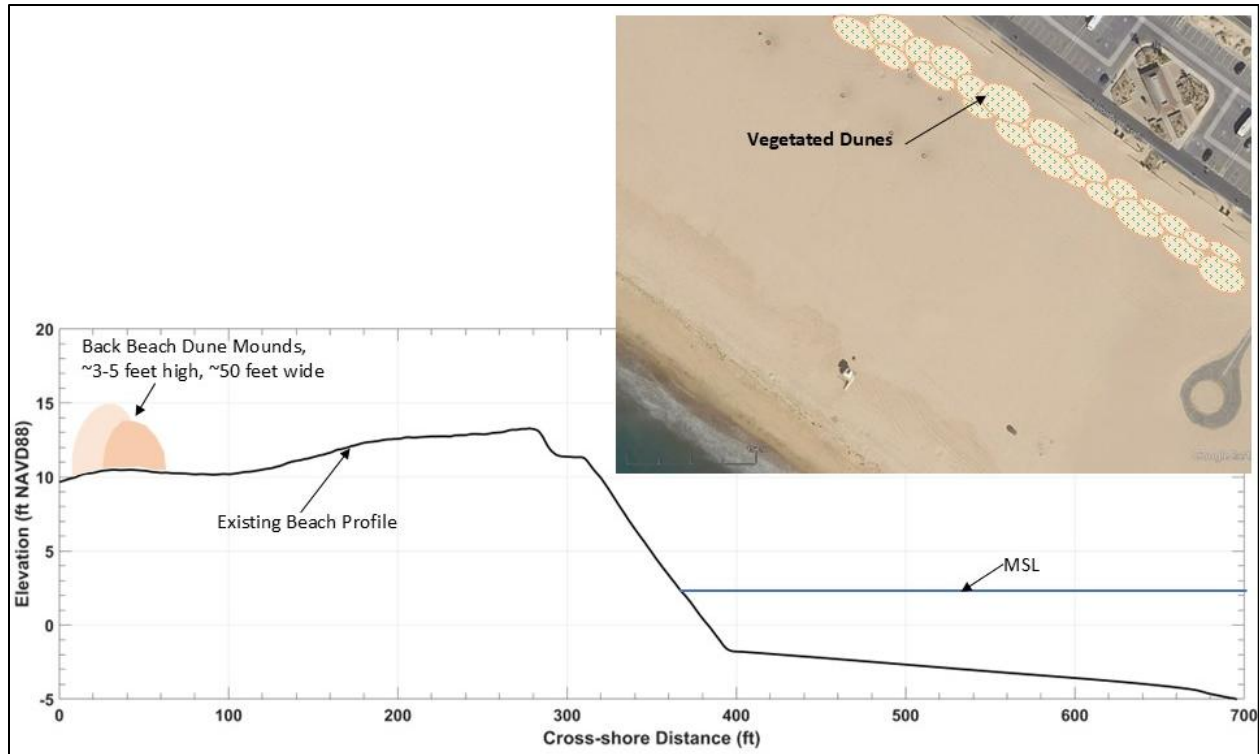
Backbeach Dunes Design Plan View and Cross Section
